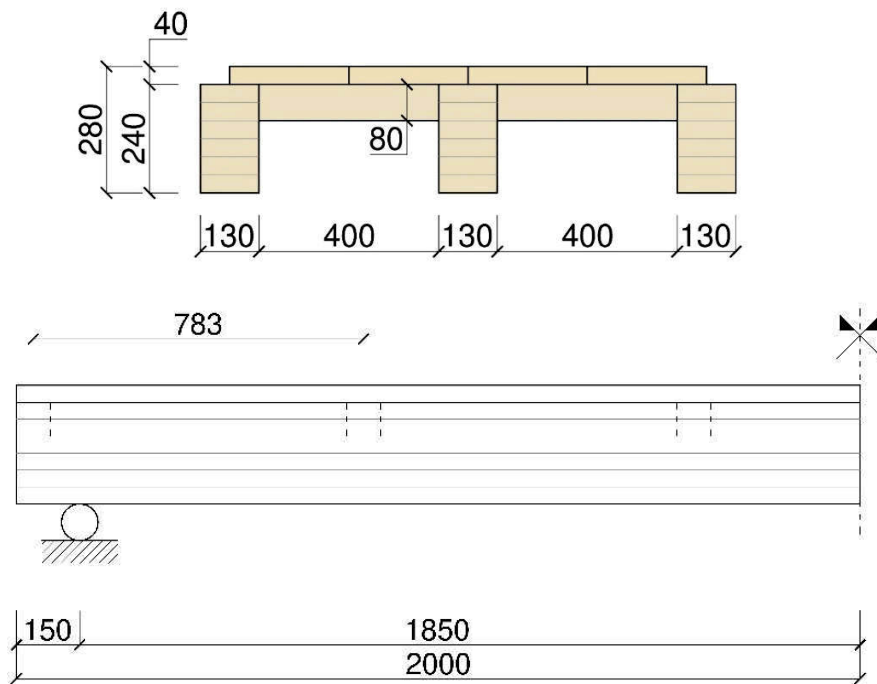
Section (up) and profile (down) of the timber floor specimen.
